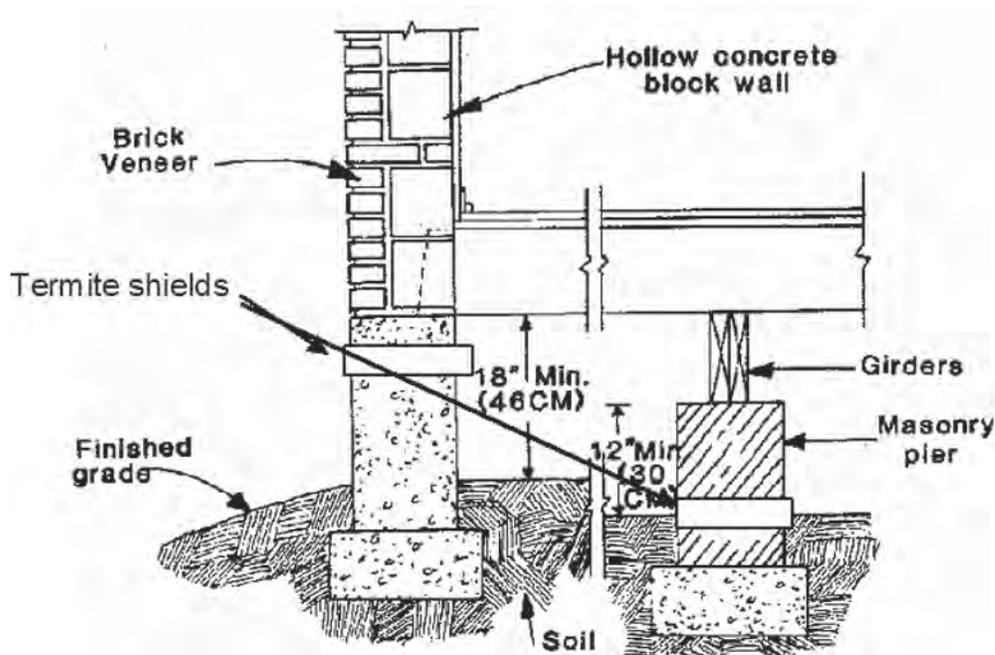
Construction Techniques That Discourage Termite Attacks: Thin Metal Termite Shield Should Extend 2 Inches Beyond Foundation and 2 Inches Down [2]
